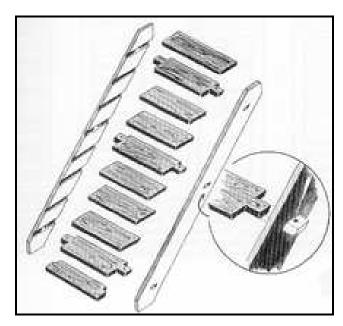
Plan for a straight stair (Lessard and Marquis 1972: 121).
